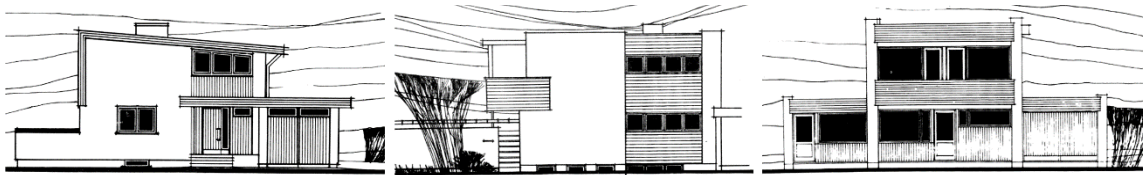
Examples of box house designs from 1976 (left to right: IE-03 (H. Kingo); 80-74 (J. Pärnik); 91-74 (L. Aljaste)) (Berends & Dobrõš, 1976)
